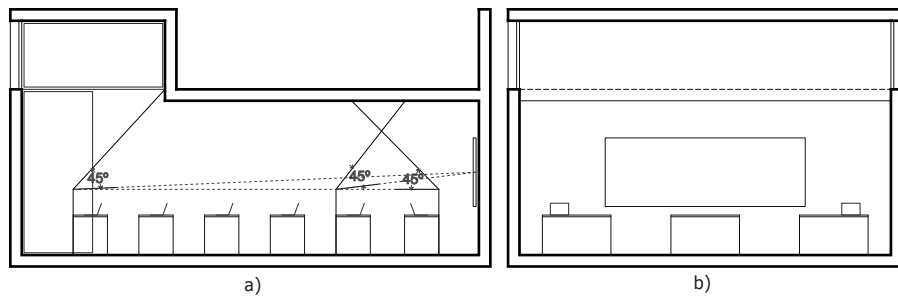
High window totally located outside the 45° central view cone, combined with a semi-raised ceiling: (a) longitudinal and (b) cross-section. The high window can be extended to the back of room wall (W1) and to the 'inner' wall (W4), as shown in (b).
